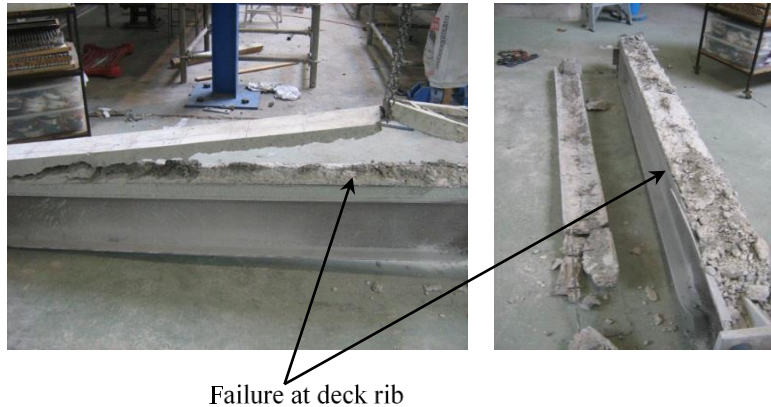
Delamination of slab surface in longitudinal deck subassembly [28]
